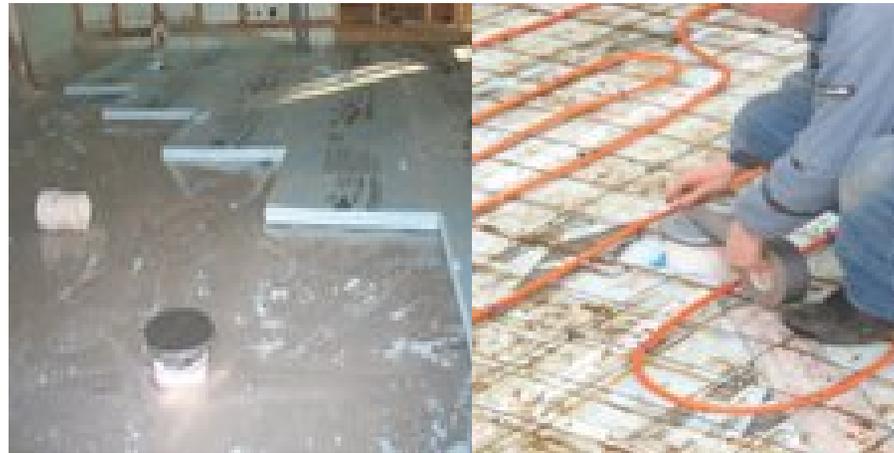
(a) Extruded polystyrene insulation layer is placed on the concrete slab (left side) and (b) the reinforcing wires together with the tubing of the floor heating system are placed (right side).
